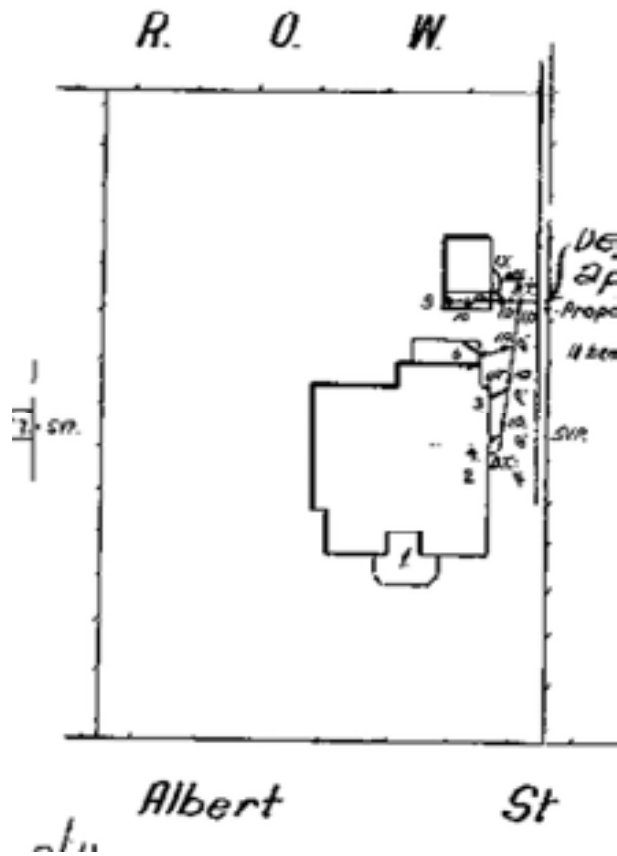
Geelong Waterworks and Sewerage Trust Individual Plan of Drainage no. 8947, 1926 (original layout date) for the former St. John’s Vicarage. Source: Barwon Water collection.
